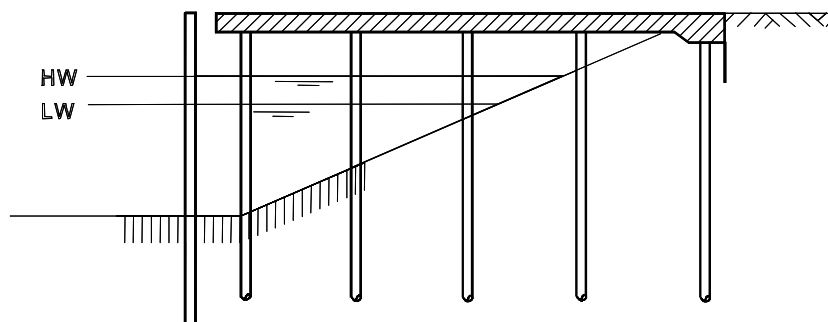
Construction above water - Principle of a jetty or open berth quay
